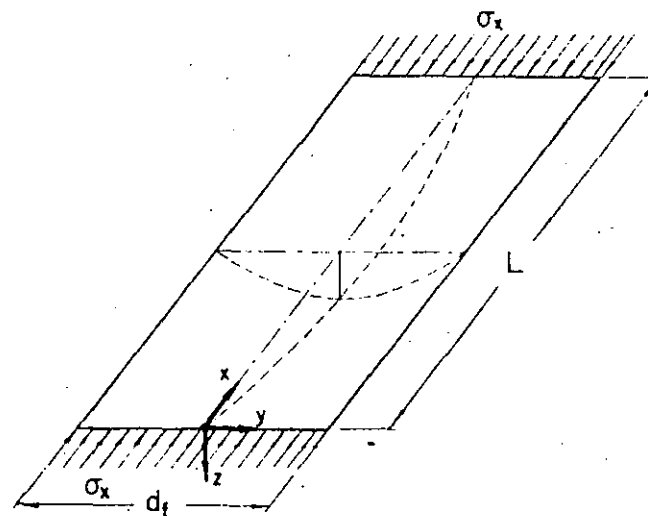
PLATE WITH ALL EDGES SIMPLY SUPPORTED SIMULATING THE WEB PLATE OF A WIDE-FLANGE SHAPE
